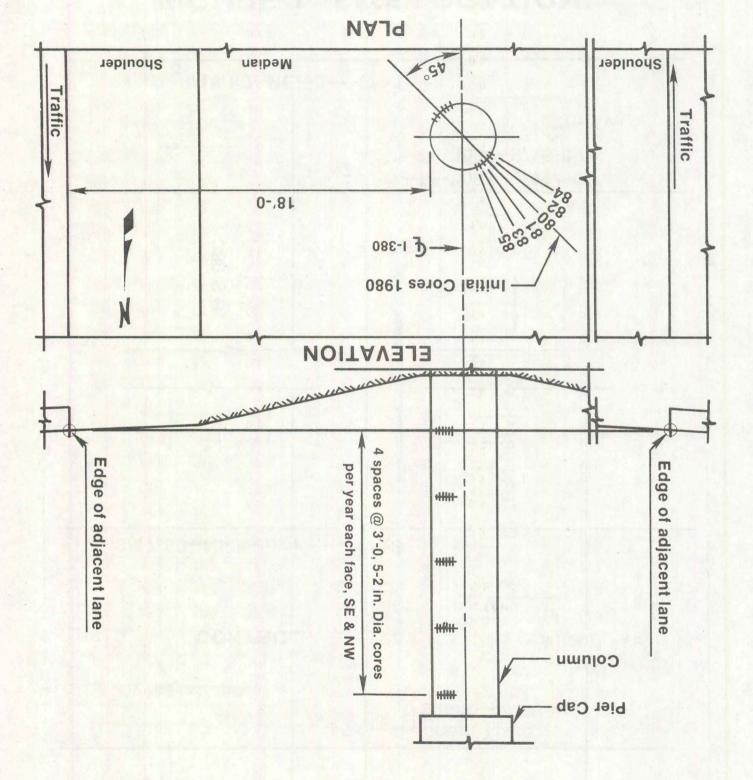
1-380 CORE SAMPLING PLAN
